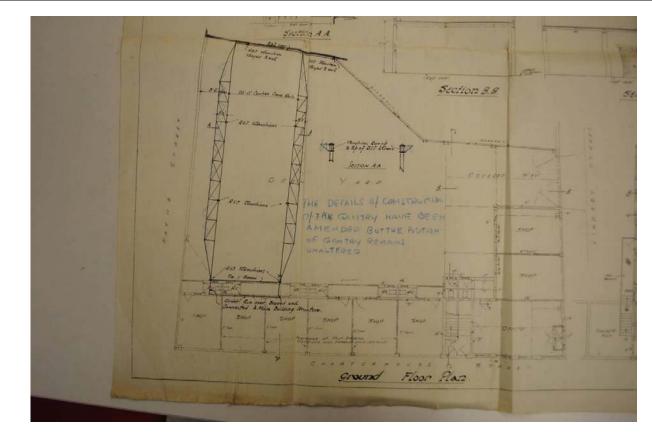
1930 plan showing evidence of the interrelationship between the structure and 8-10 Hayne Street with a girder between the two structures. (Source - LMA, GLC/AR/BR/22/BA/043620)
